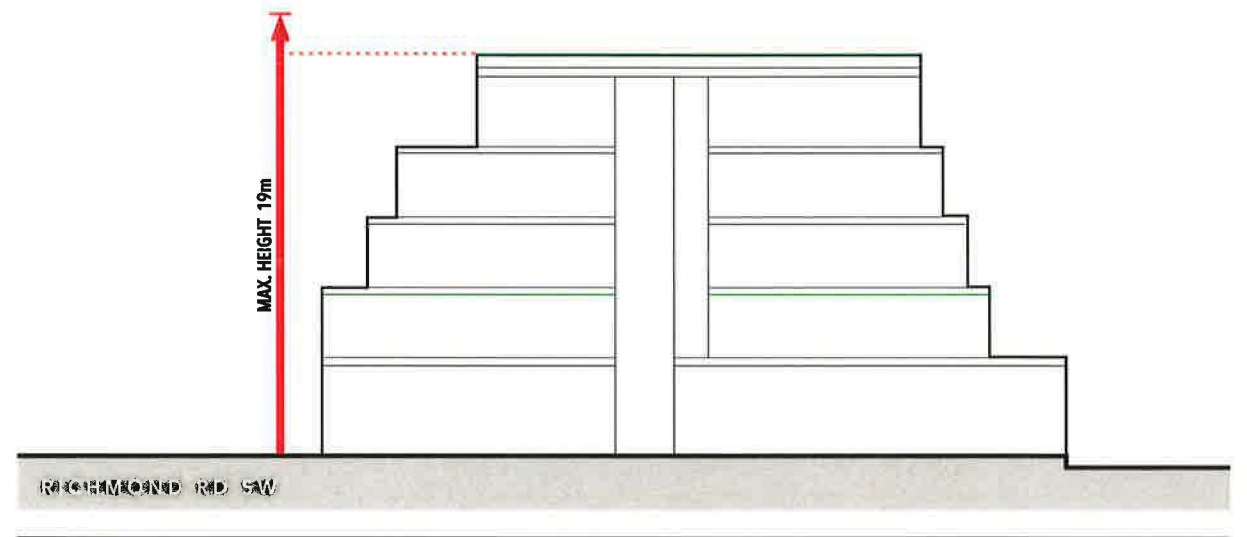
PROPOSED BUILDING HEIGHT MODIFIER
